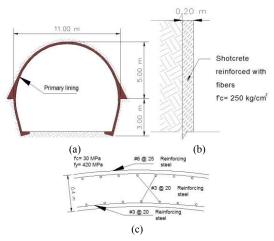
(a) Tunnel cross section, (b) primary lining, and (c) secondary lining.
